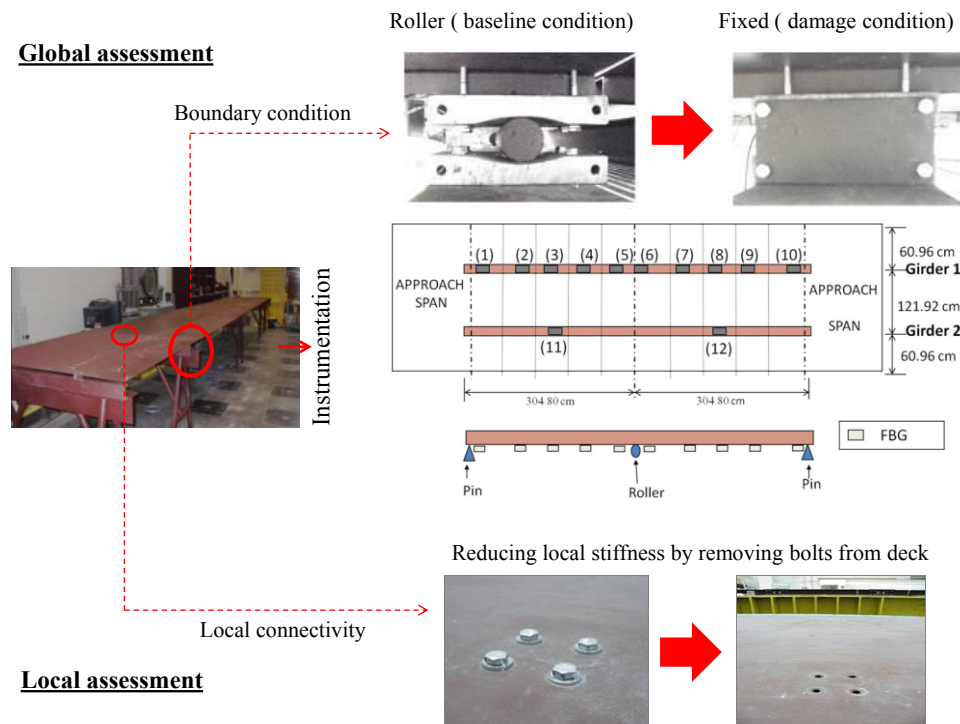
Structural description and applied damage (UCF 4-span Bridge)
